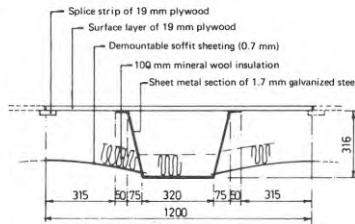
Roof cassette used for extending the Plywood Works at Otterbäcken - cross section.
